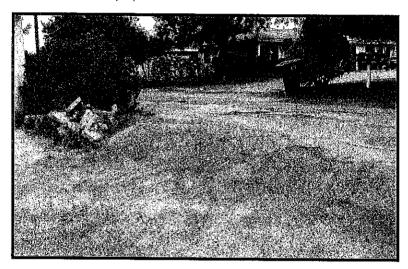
Access to Private Residences at 164, 171 and 187 Walnut Street
